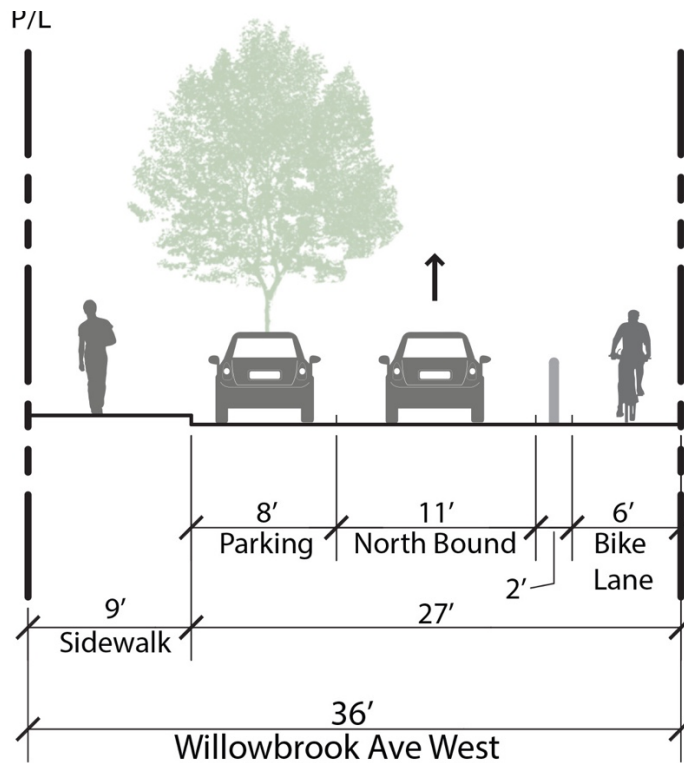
Willowbrook Avenue West Typical Cross-Section.
